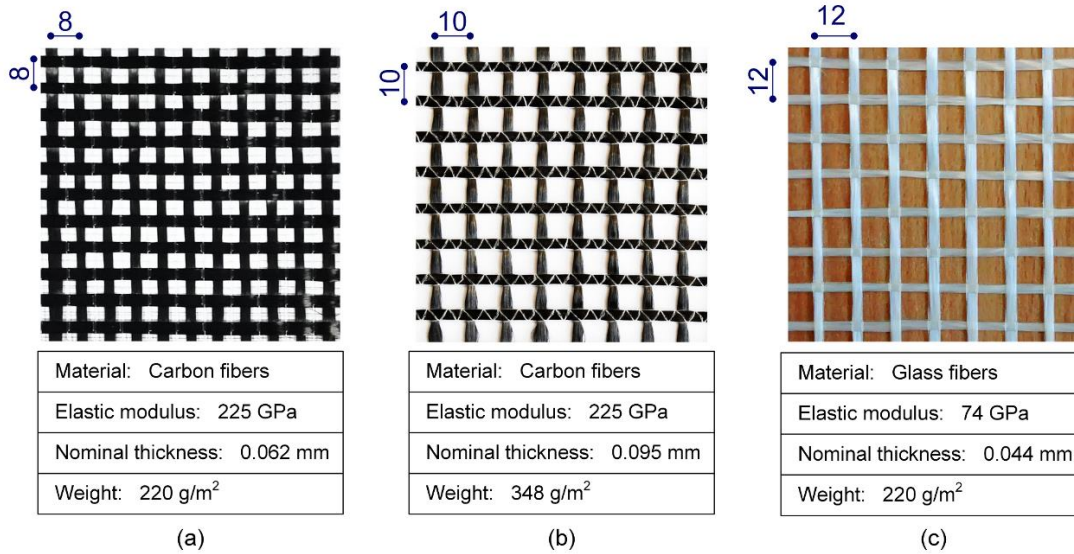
Textiles fabrics: (a) light carbon-fibre textile; (b) heavy carbon-fibre textile; (c) glass fibre textile; Source [50].
